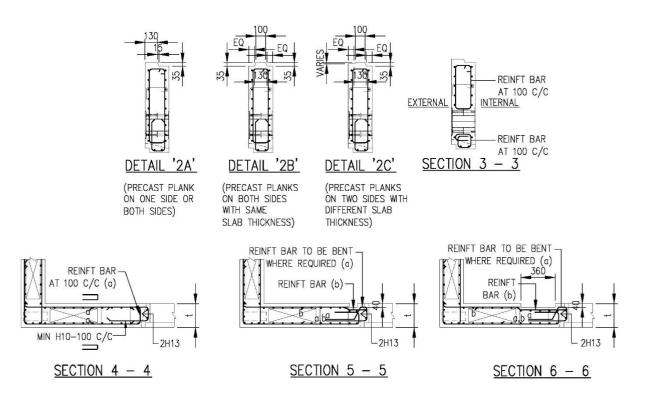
(h) REINFORCEMENT BAR DETAILS AT CONCRETE RIB
